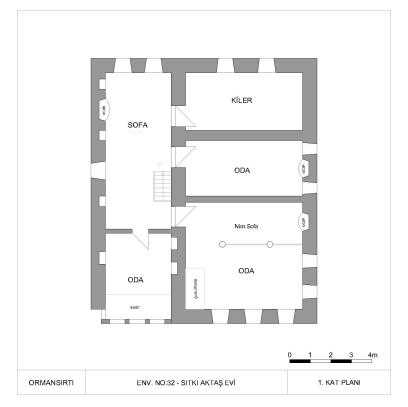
Plan Scheme of Sıtkı Aktaş House (Ormansırtı Village).
